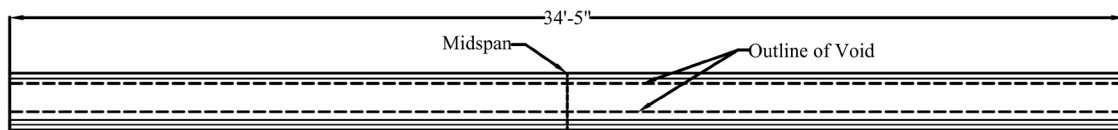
Rehoboth Bridge strand layout (side elevation)
